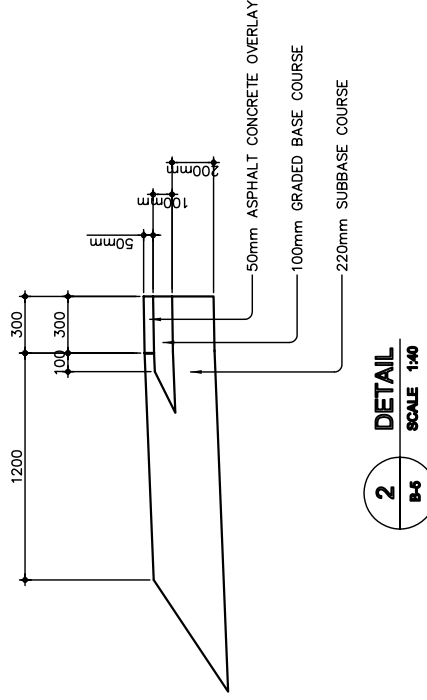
Typical Roadway Section(1) Type "B" and "C"
